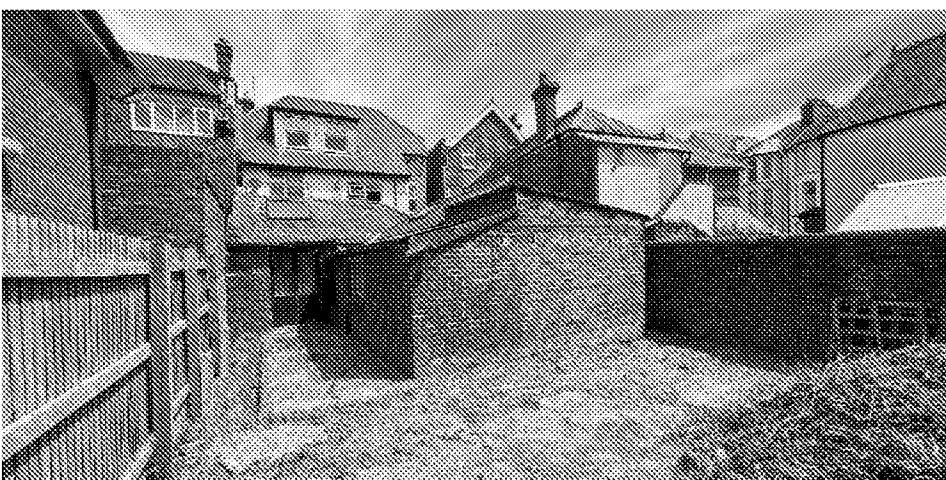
Application site Viewed from Rear of 47 Aldwick Road
